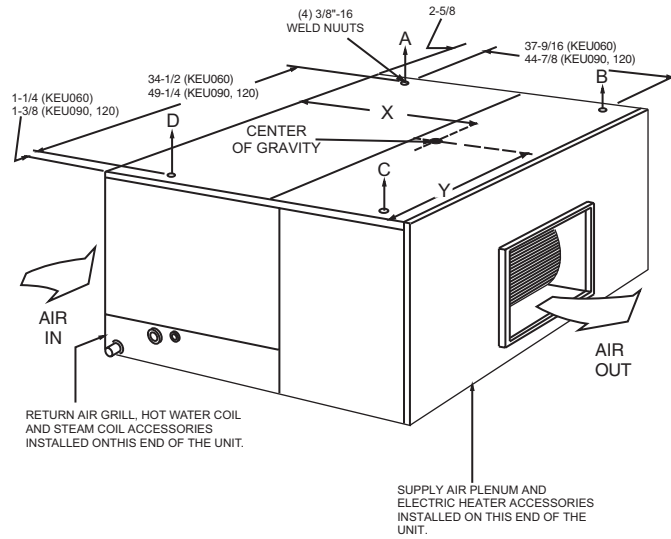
SUSPENSION MOUNTING (HORIZONTAL) - KEU060, 090 AND 120
